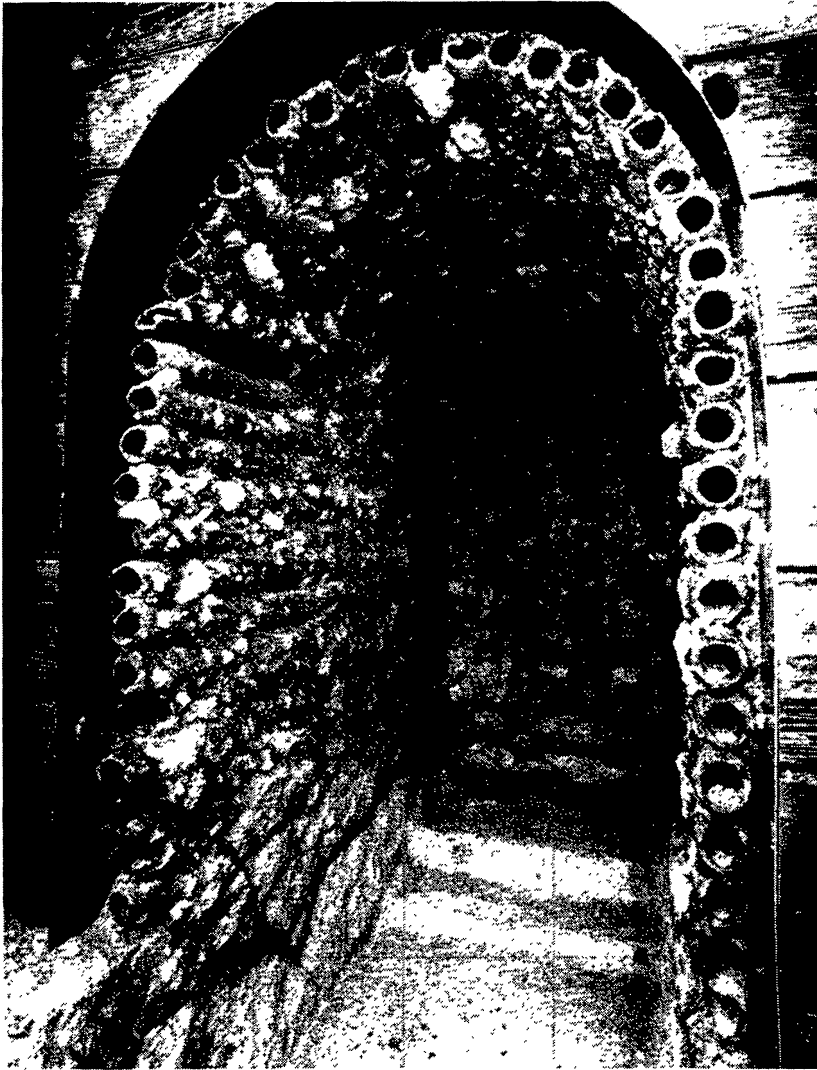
Photograph of prototype melted-in-place structure. Dimensions are 2 by 1 m at the opening, and 2 m deep. Interior rock and soil excavated after melting construction of arch and walls.
